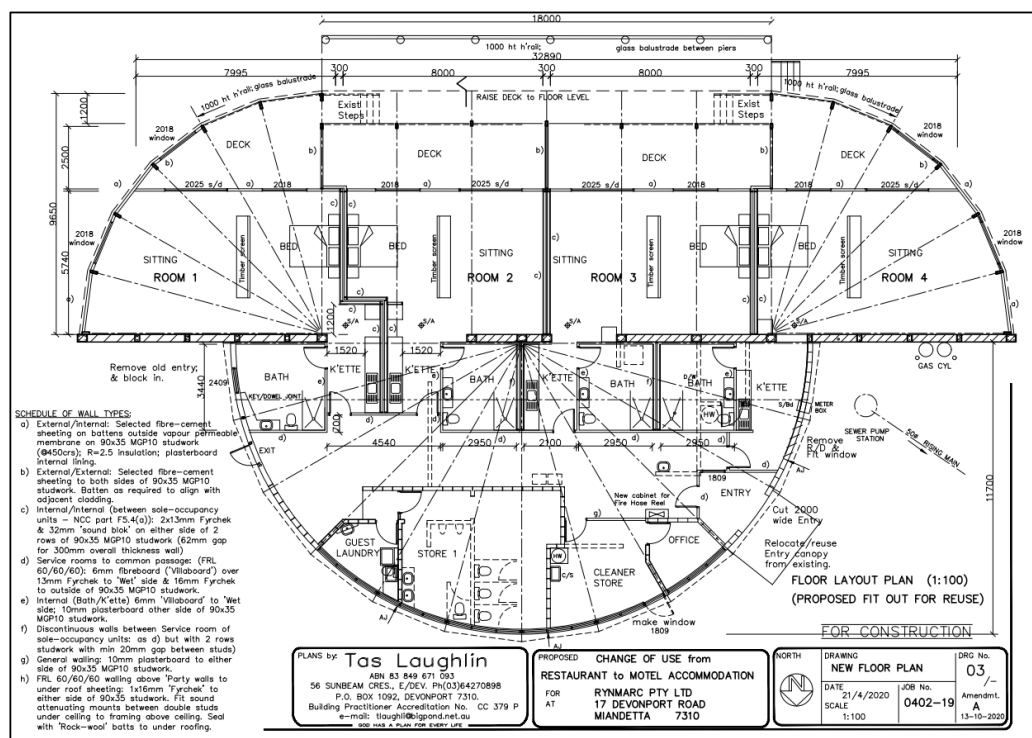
Proposed layout of the existing building for the use class Visitor Accommodation
